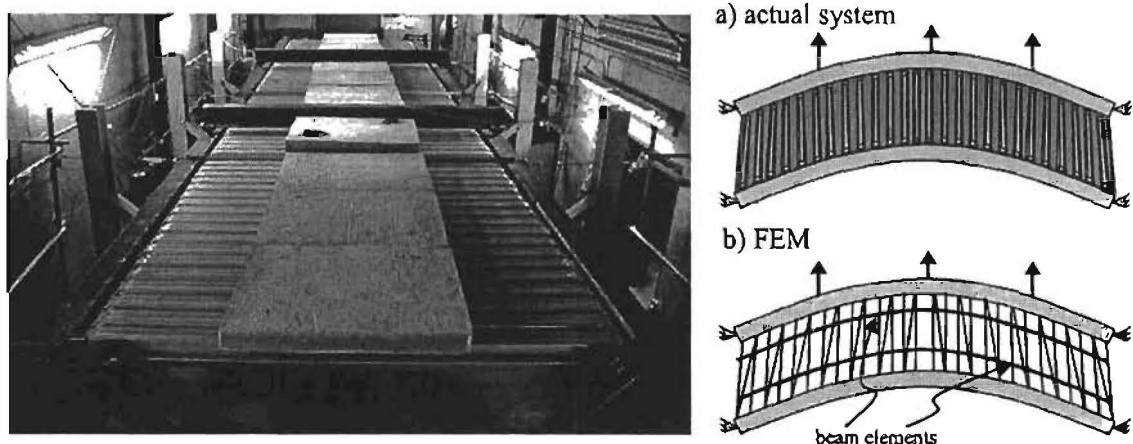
Left- Fully Decked (24ft) PMDF Specimen with Concrete Dead Load; Right- Calibration of Beam Element from Unstiffened Fully Decked System
